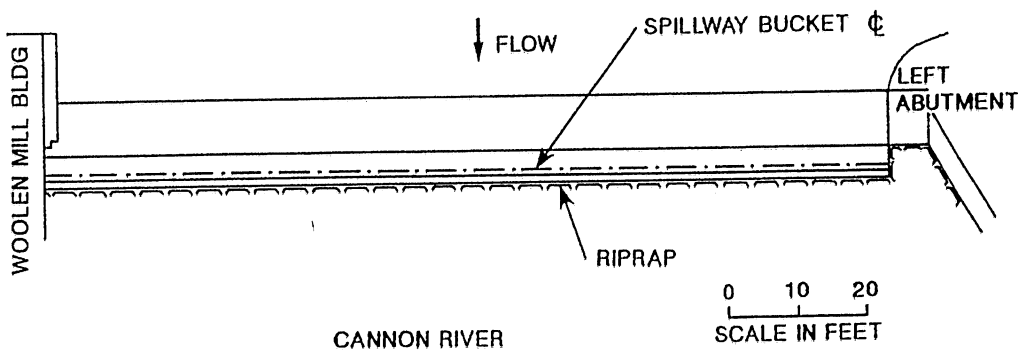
Plan view of Faribault Woolen Mill Dam
